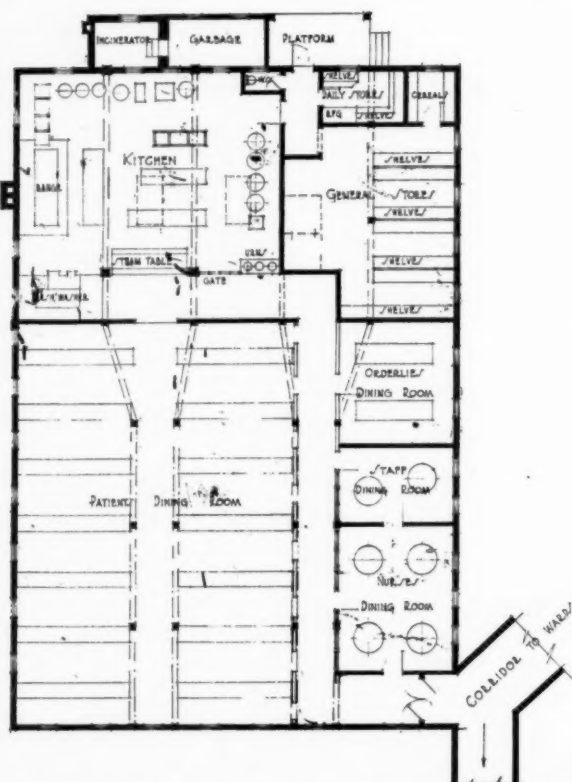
Plan of the Military Hospital at Davisville, North Toronto, Canada, showing the general arrangement of the dining rooms and kitchen.
